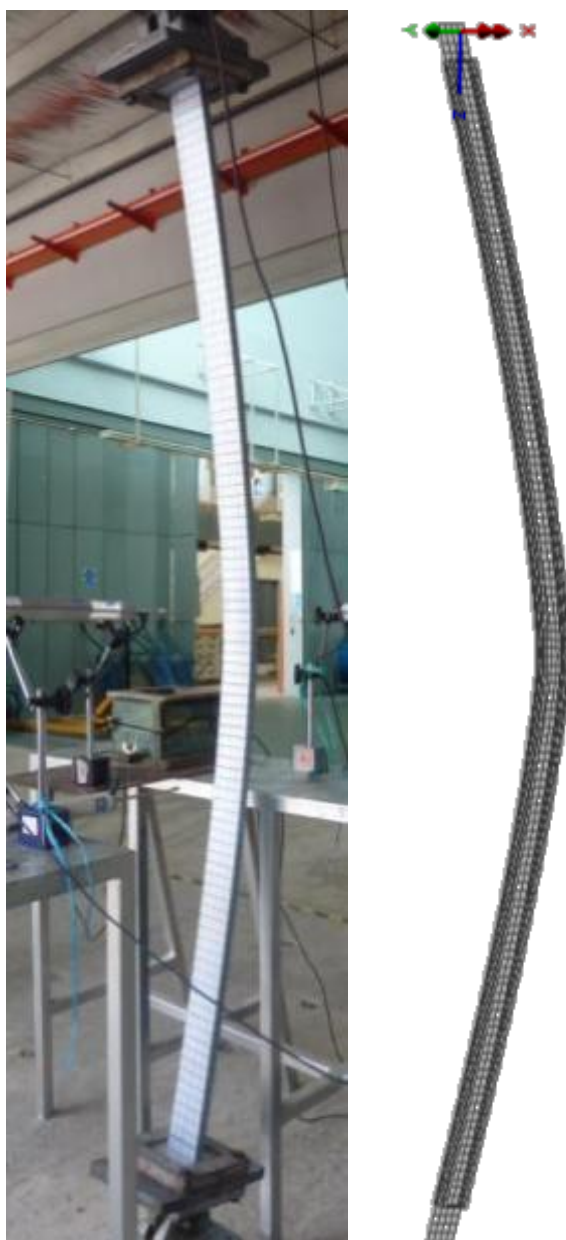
Failure Modes of FE and Tested C75L2000 C-channel (C) Slender Columns
